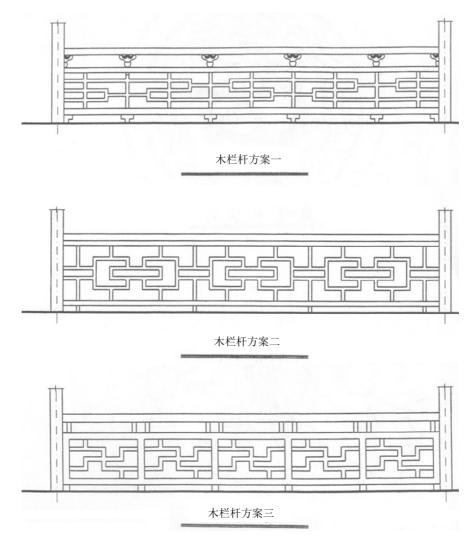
Elevational drawing of wooden baluster 图 4. 木栏杆立面图
